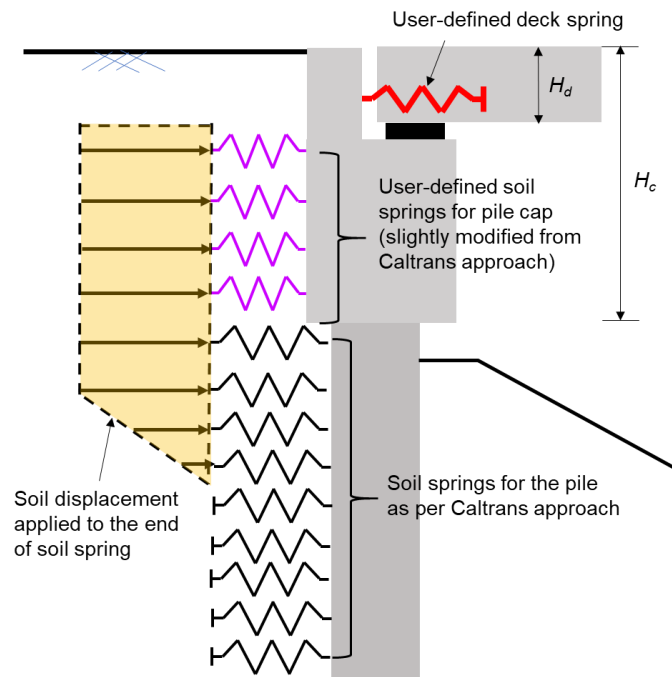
Schematic representation springs for deck, pile/abutment cap and piles using the proposed approach.
